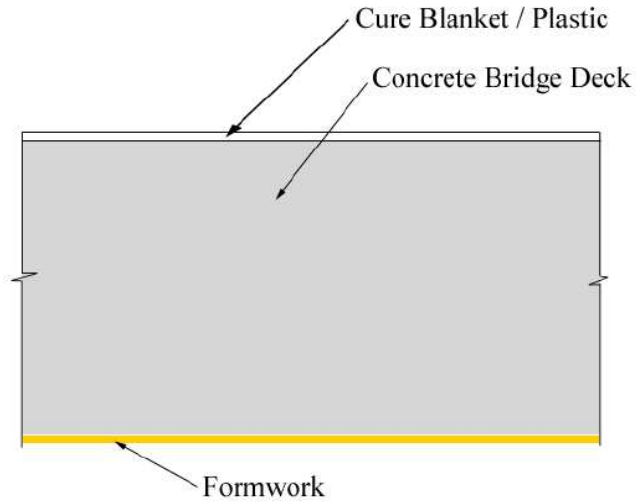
Bridge deck model used by ConcreteWorks (Riding 2007)
